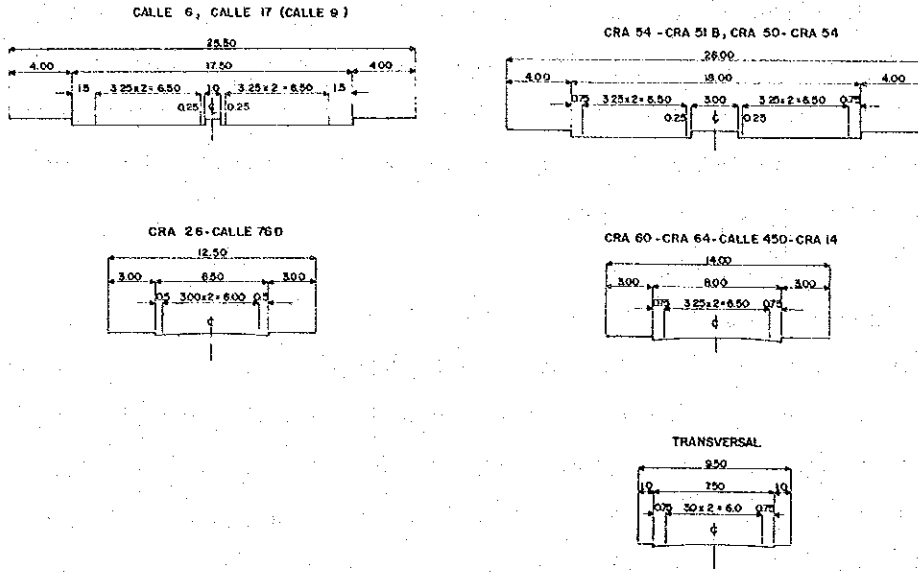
(1) Cross Section for the Streets Plan in Barranquilla
